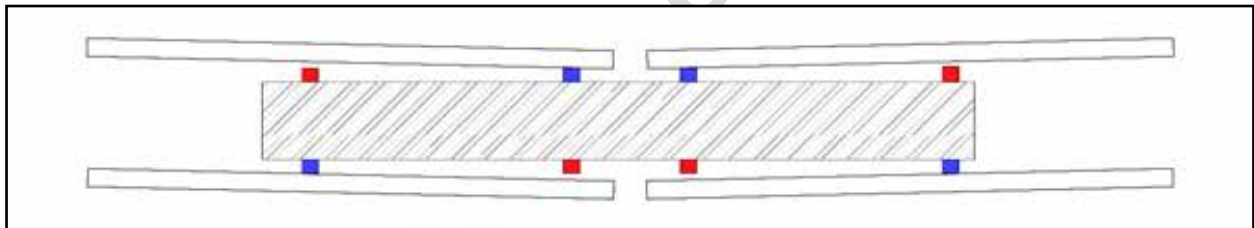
Midspan Expansion Joint: Bearings which were Initially Tight
